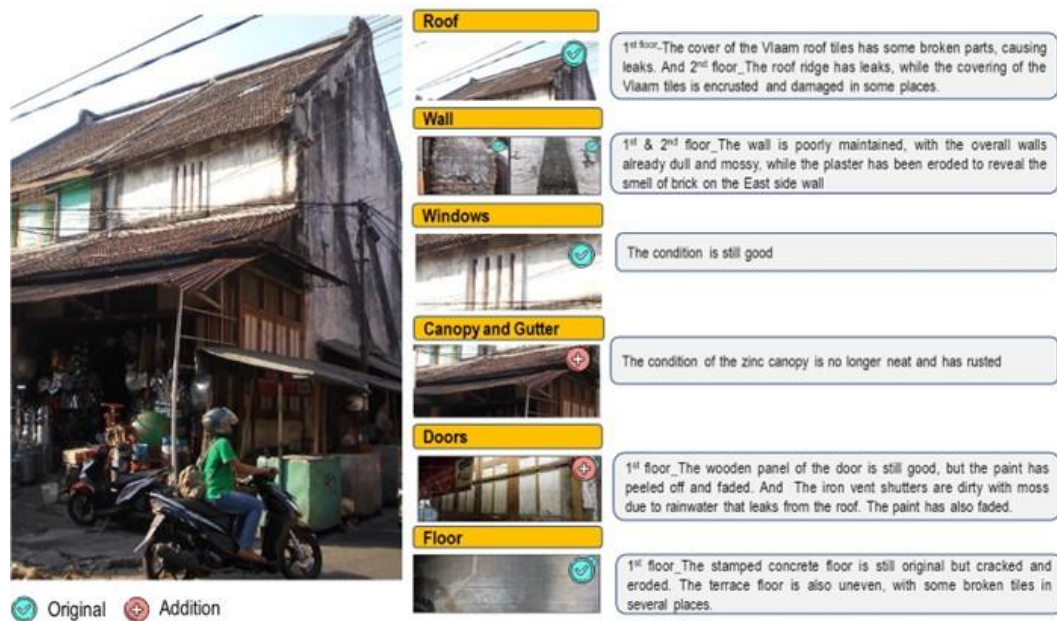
Identification of Facade Damage of the 41 Shop House
